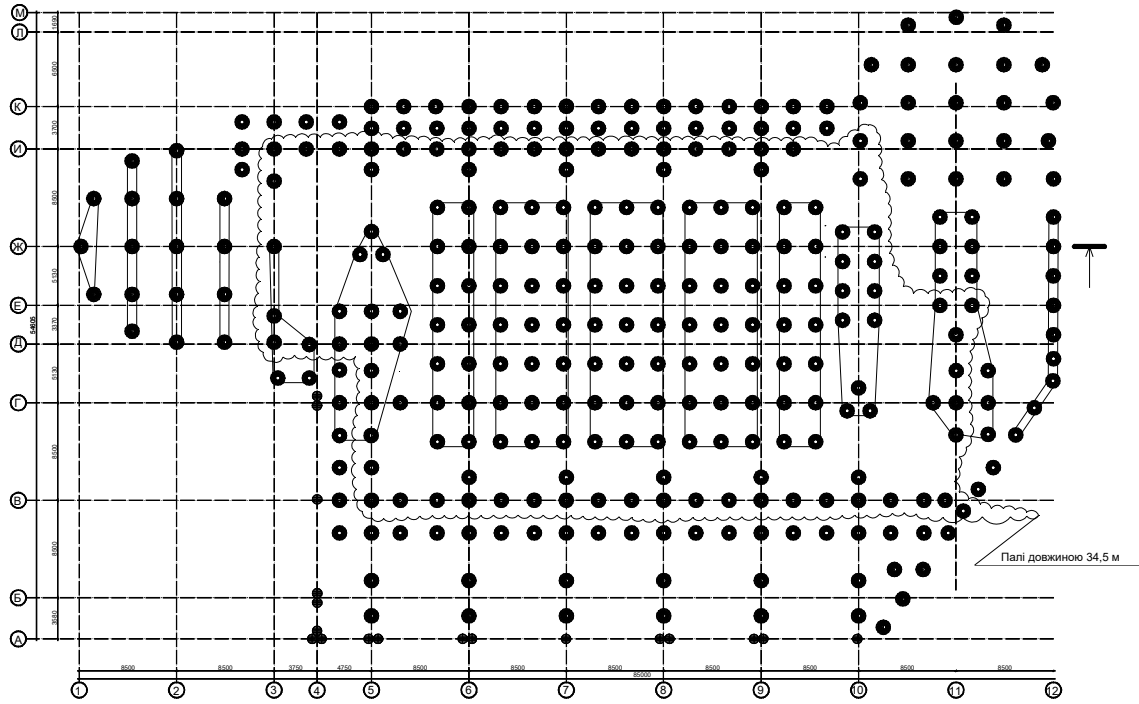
Plan of the pile field with various pile lengths – Type 2
